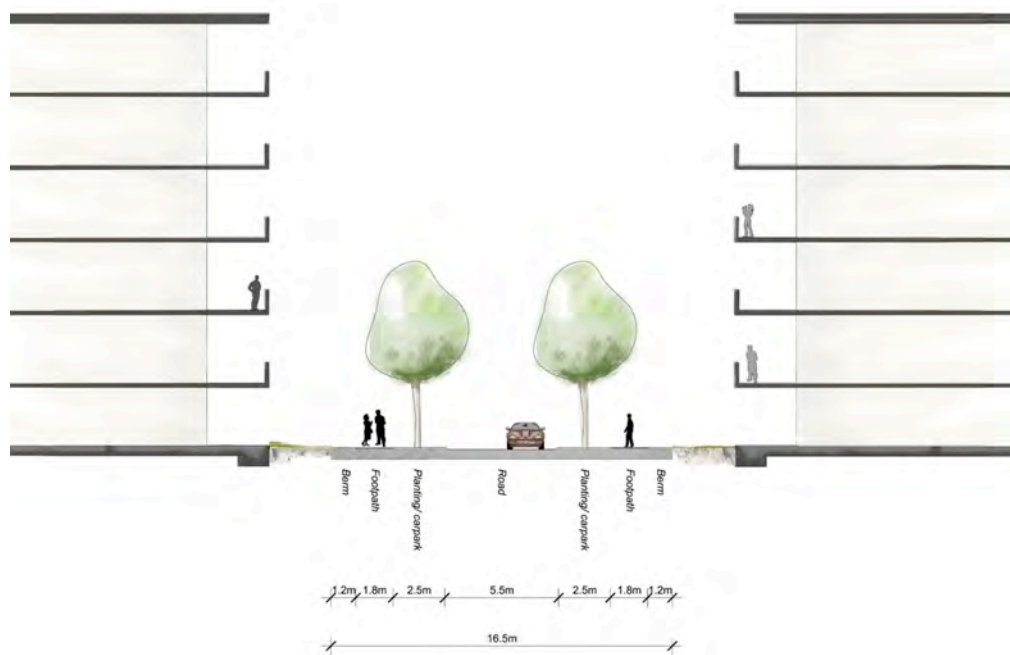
Indicative Street Section – Walpole Street extension between Area A and Area B (16.5m wide)
